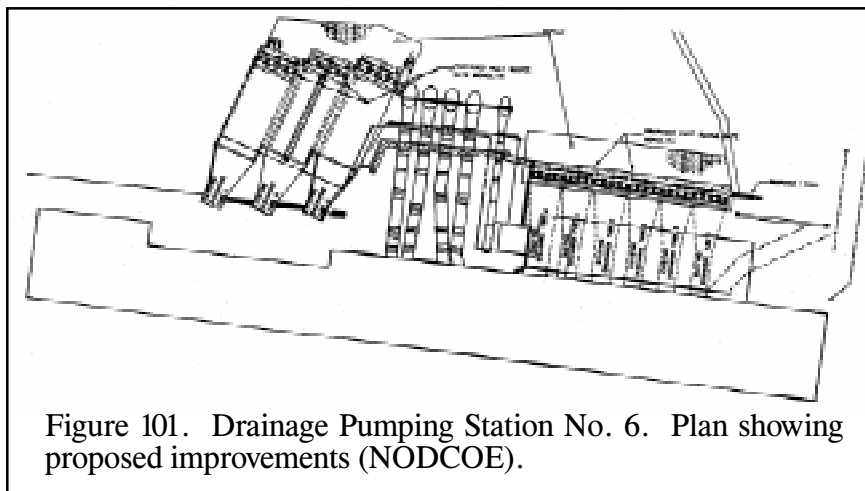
Drainage Pumping Station No. 6. Plan showing proposed improvements (NODCOE).
